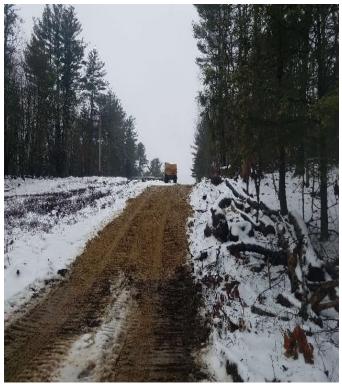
Crew installing stone on sloped sections of the access road between Strs. 52-58 for concrete truck access. This area is next to Str. 53. Viewing west. (02-11-20).
